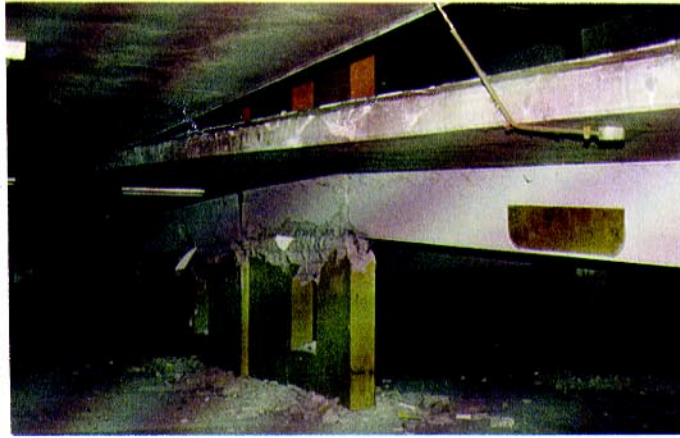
Failure of diaphragm-to-wall connection limited effectiveness of shear wall
